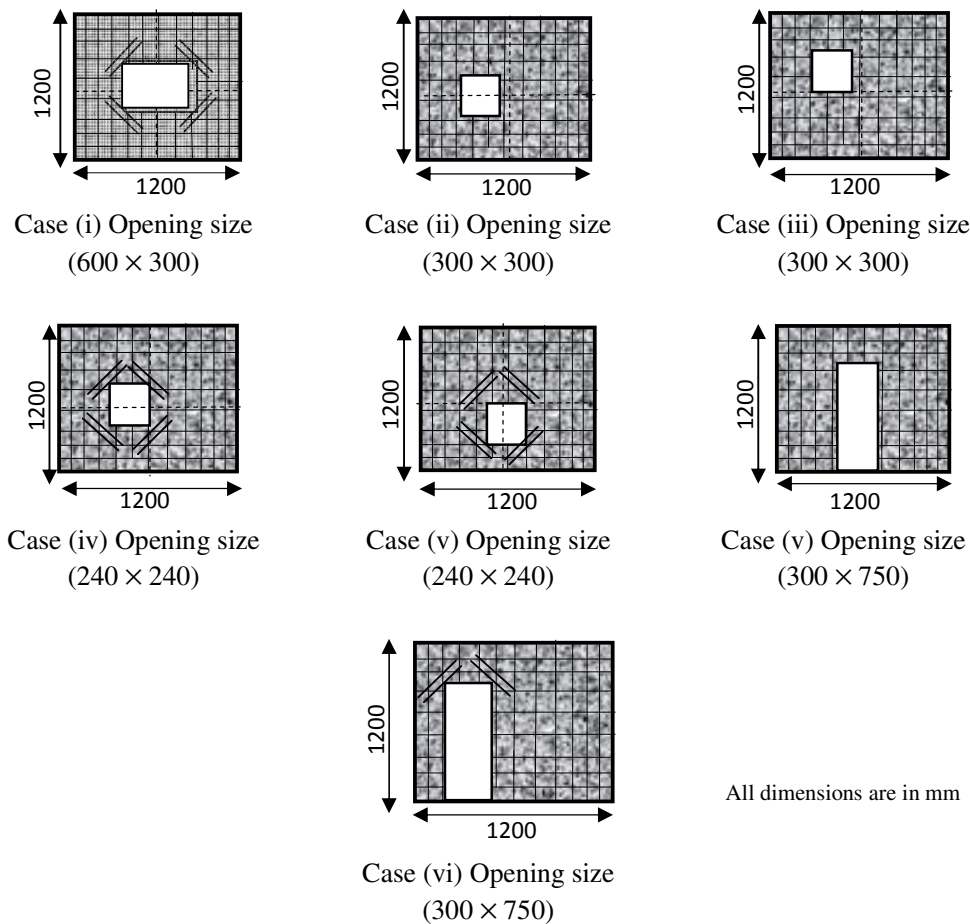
Shear wall panels with openings of various sizes and locations (Lee, 2008)
